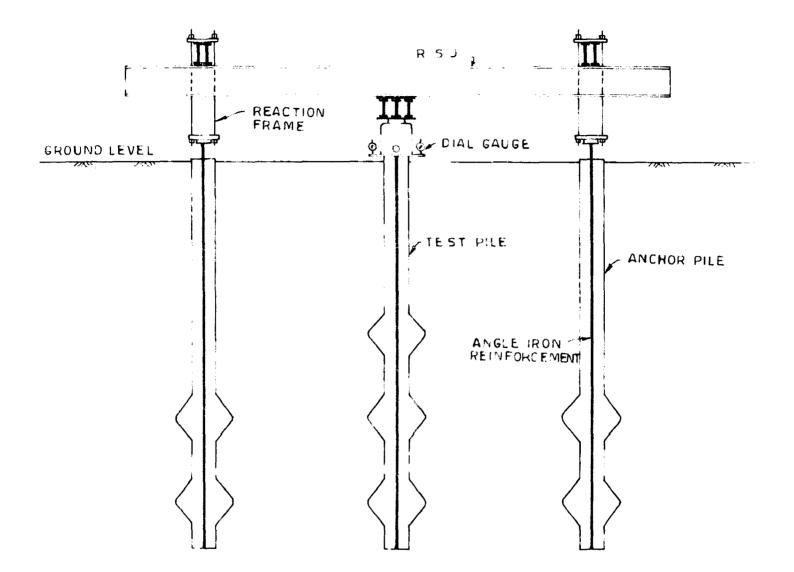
FIG. SP _ TYPICAL PILE LOAD TEST SET-UP
